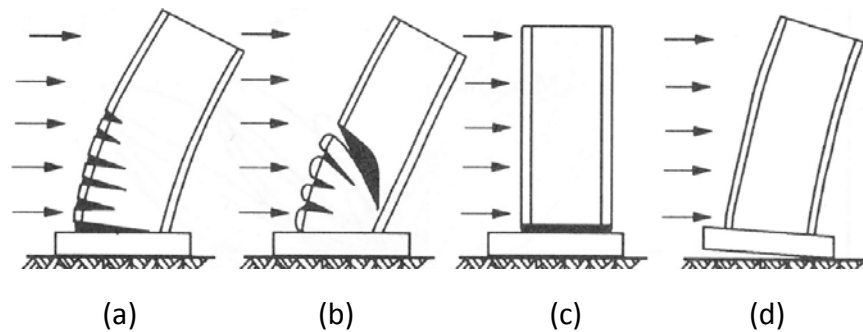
Failure modes of slender masonry structures; (a) flexion; (b) shear; (c) rocking: by base uplifting and (d) by foundation uplifting [Bazan and Meli, 2003]
